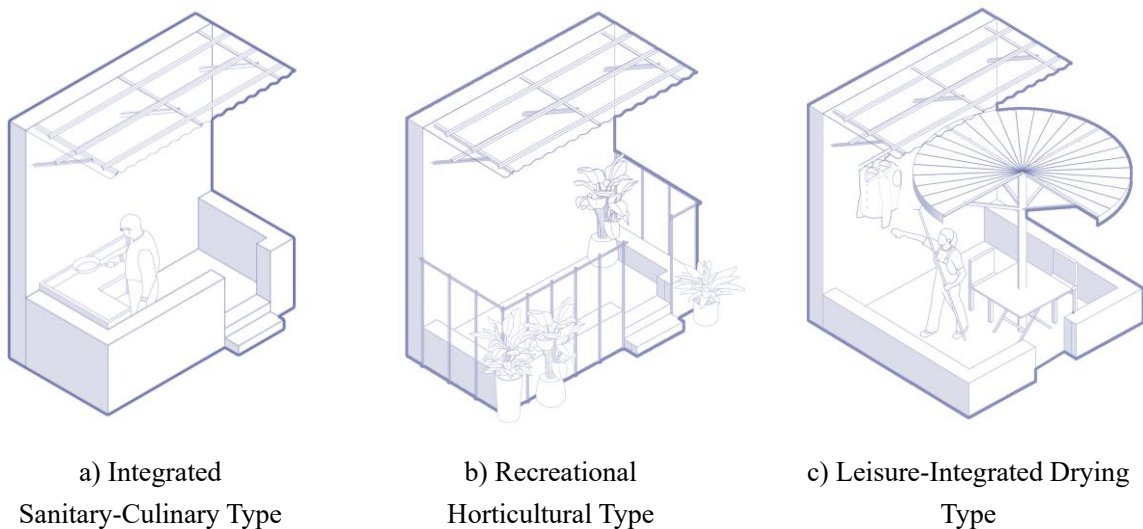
New "OUTDOOR ROOM" pattern in Residential Living Contexts (Source: author)
